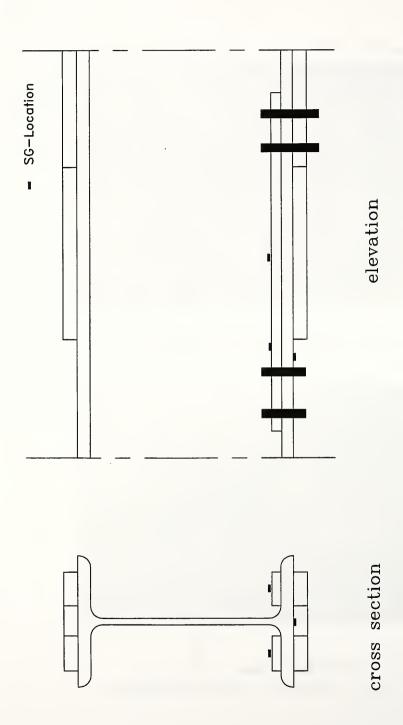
Strain Gage Locations. (Specimen NR12)
